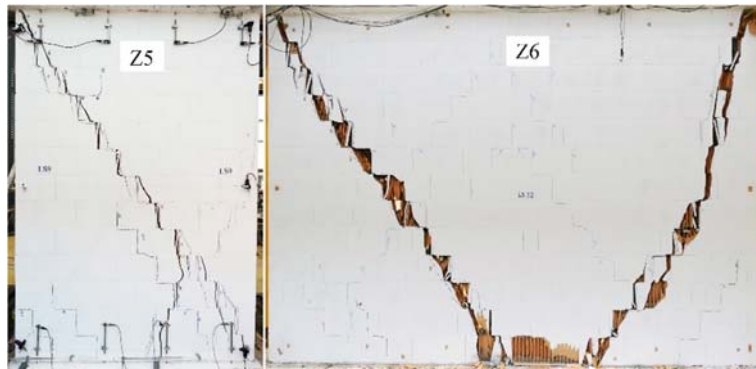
Final crack patterns of specimens Z5 and Z6 [40]
